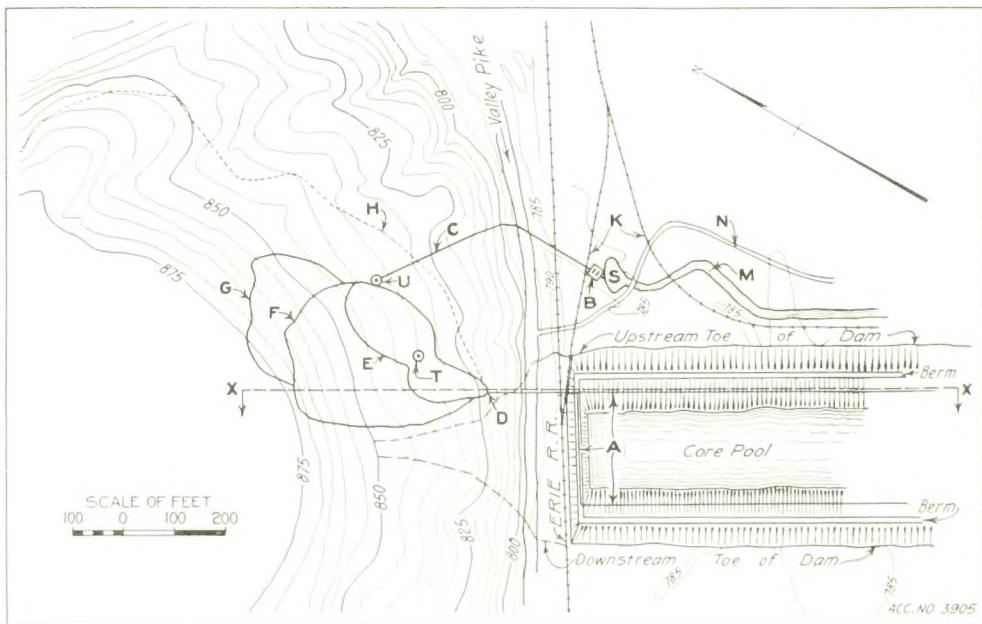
HILLSIDE BORROW PIT LAYOUT AT HUFFMAN DAM
